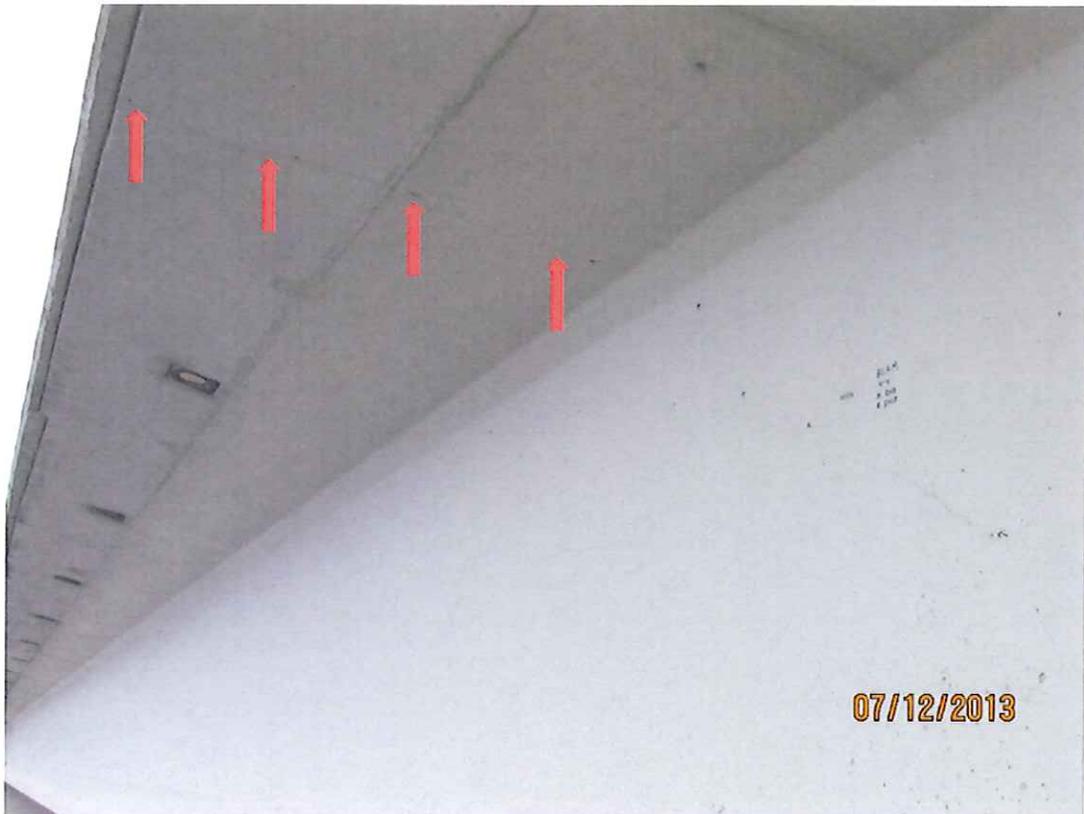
Beam 4-4 showing typical crack extending from web across bottom flange and deck
